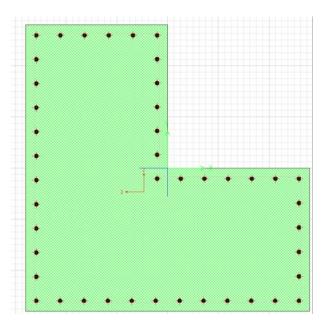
Modelling of the L shaped Column using the Section Designer Tool inside SAP2000.
